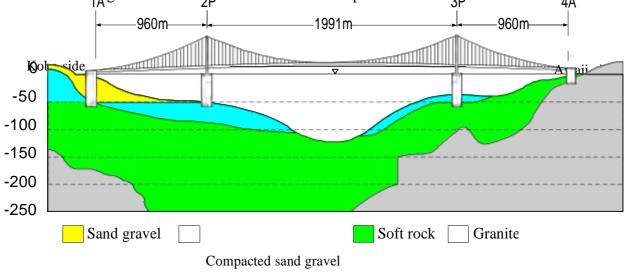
Geological profile and general view of the Akashi Kaikyo Bridge
